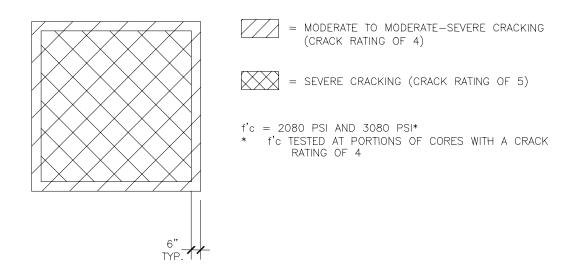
COLUMN CROSS-SECTION BASED ON CRACKING IN CORES C33 AND C43
